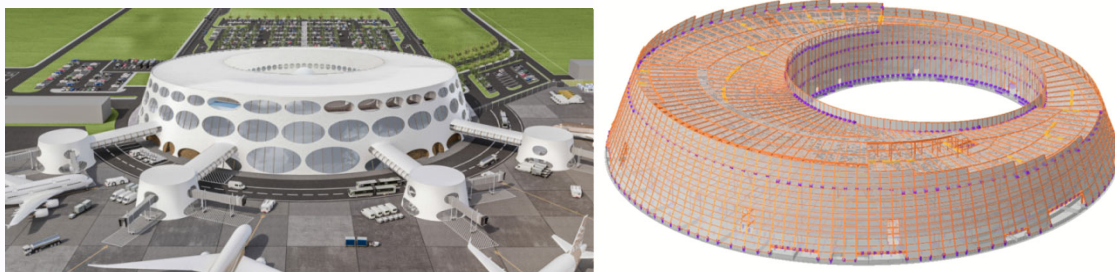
Elizovo airport building (Steel Hysteretic dampers, left) and calculation model (right)
